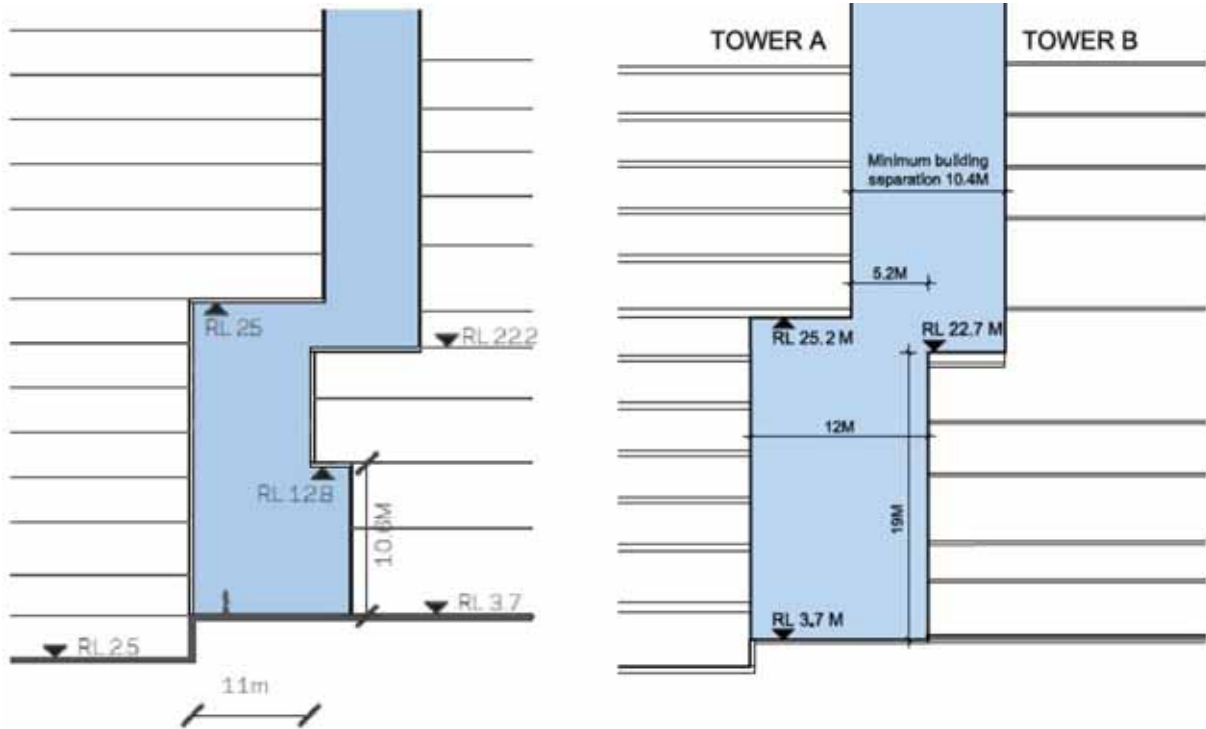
Lodged (left) and revised (right) north/south through site link (Source: Applicant's RtS)
